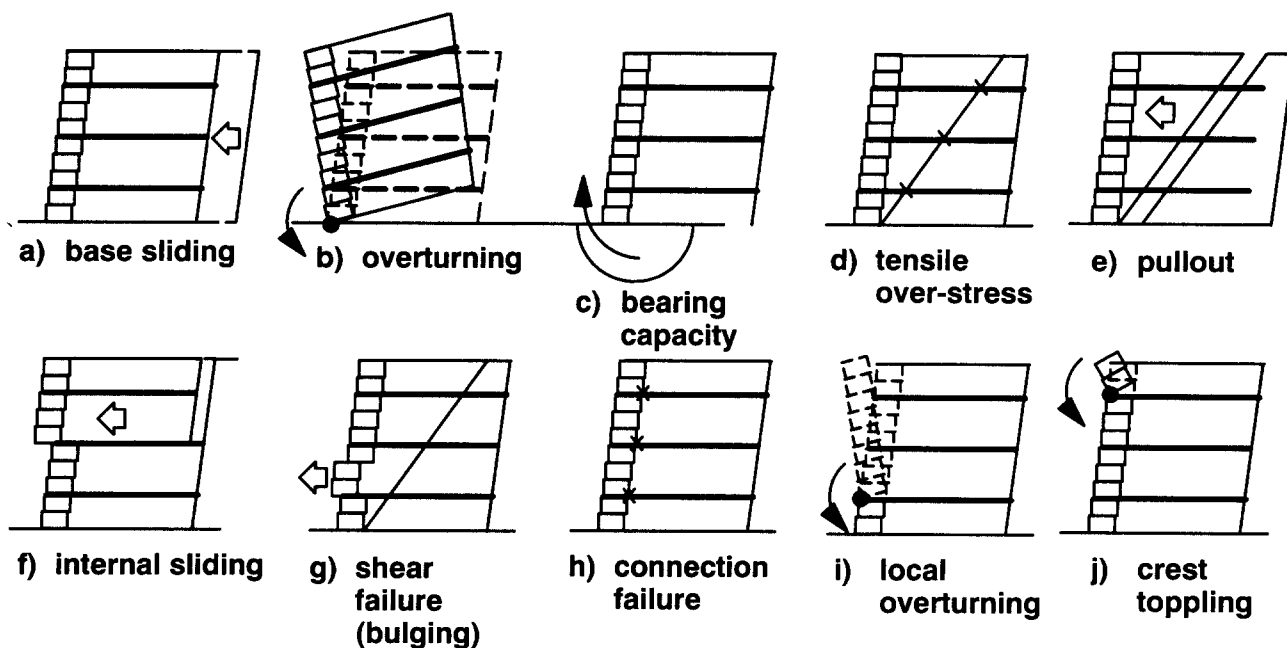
Modes of failure for reinforced SRW structures: external (a,b,c); internal (d,e,f); and facing (g,h,i,j) (after Bathurst and Cai 1995)
